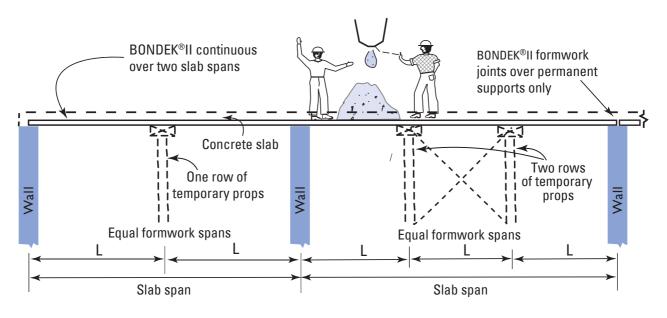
LYSAGHT® BONDEK® II formwork for masonry
